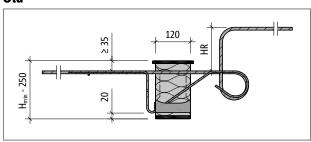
Schöck Isokorb® XT type K-HV: Product section
